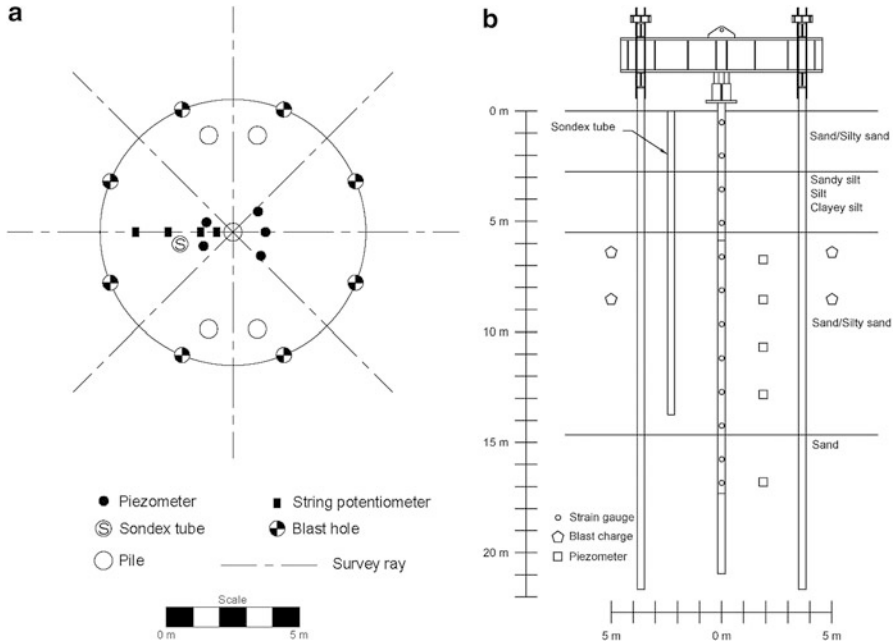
(a) Plan view and (b) profile view of test pile, blast charges, and instrument layout
